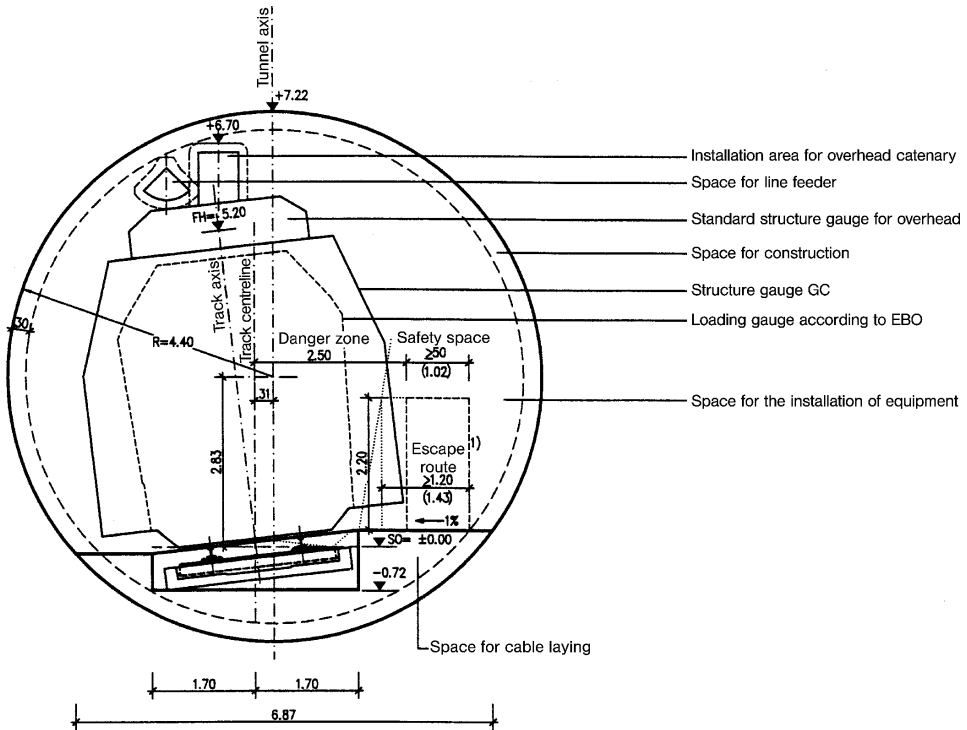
Guideline detail for a single-track tunnel with circular cross-section for passenger and goods traffic according to RiL 853.
